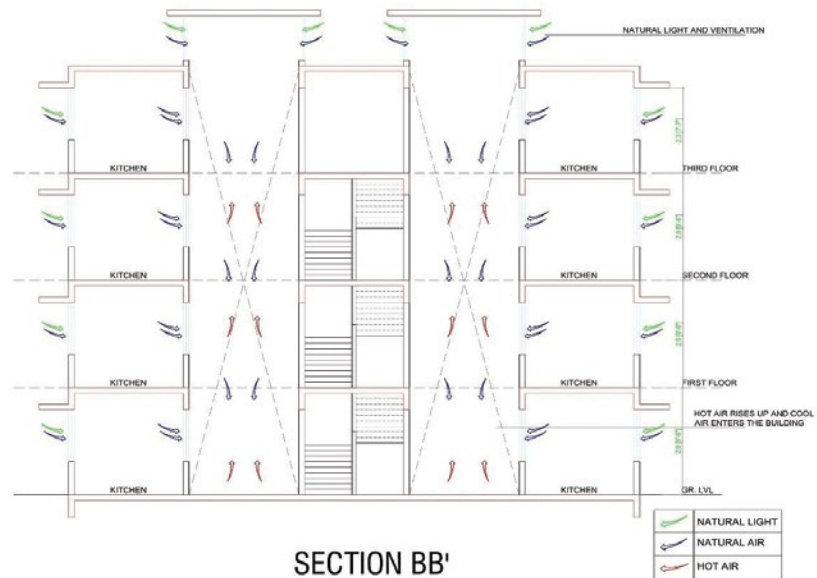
The arrangement of natural light and ventilation in the G+3 building
